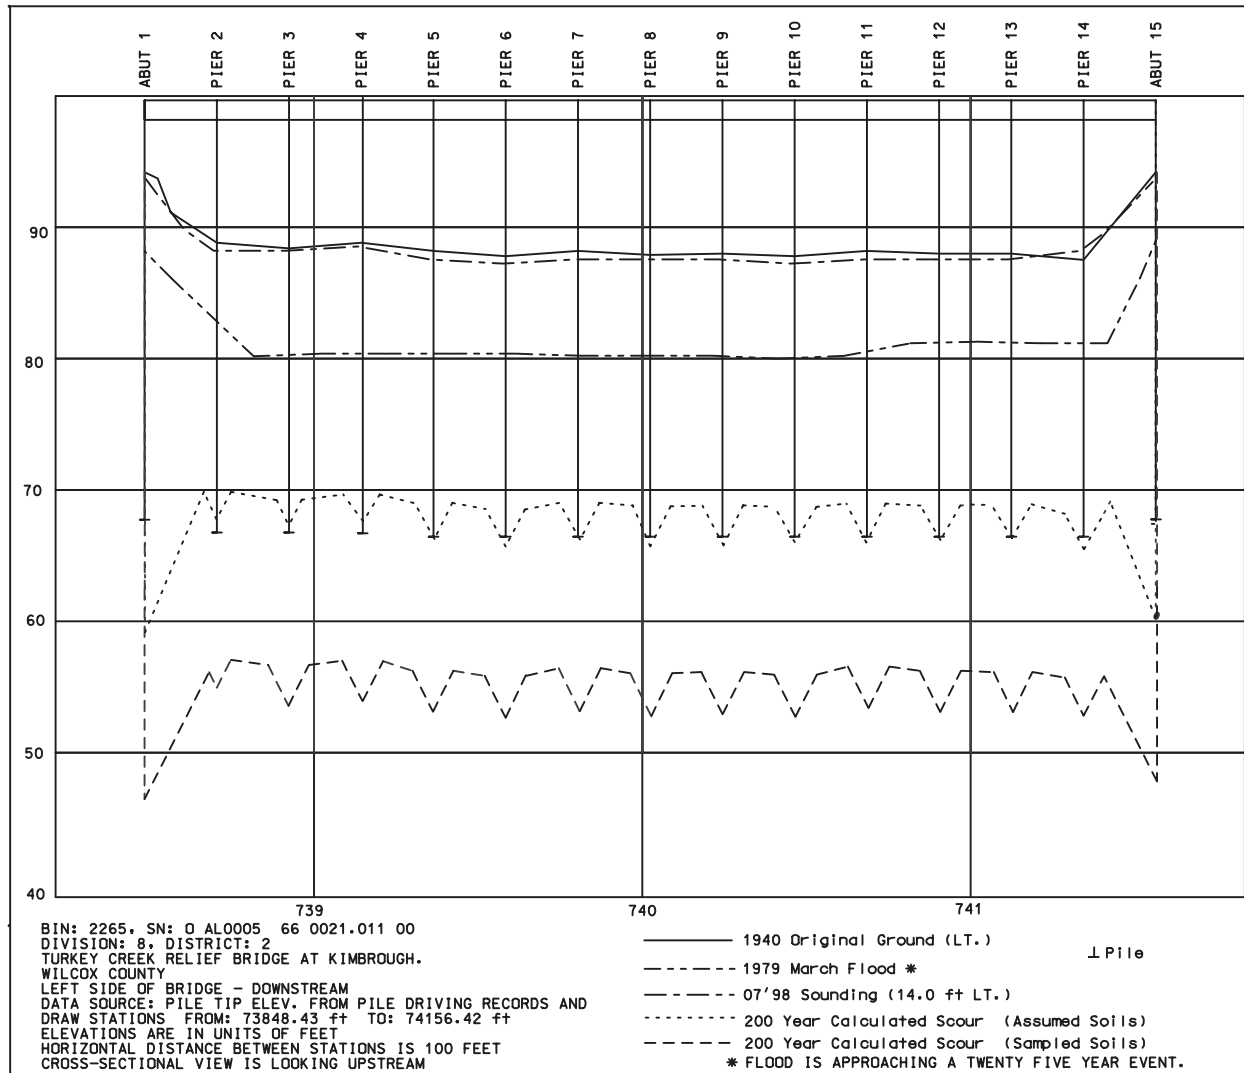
Sounding profiles and scour evaluations for relief bridge 1 at the Turkey Creek site at Kimbrough
